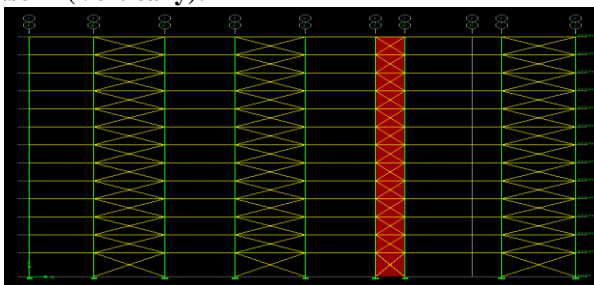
Elevation view of building with alternate bracings. (Vertically from 2bay)
